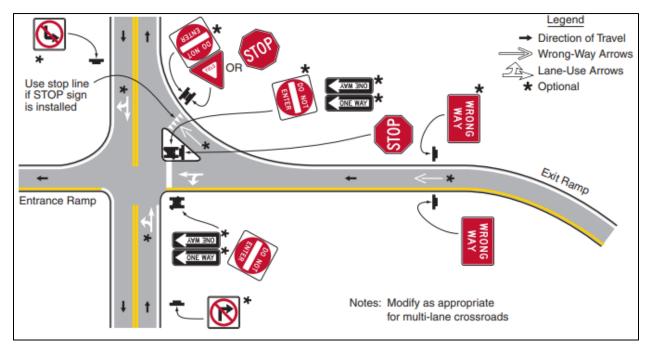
Application of Regulatory Signing and Pavement at an Exit Ramp Termination to Deter Wrong-Way Entry (MUTCD 2009)
